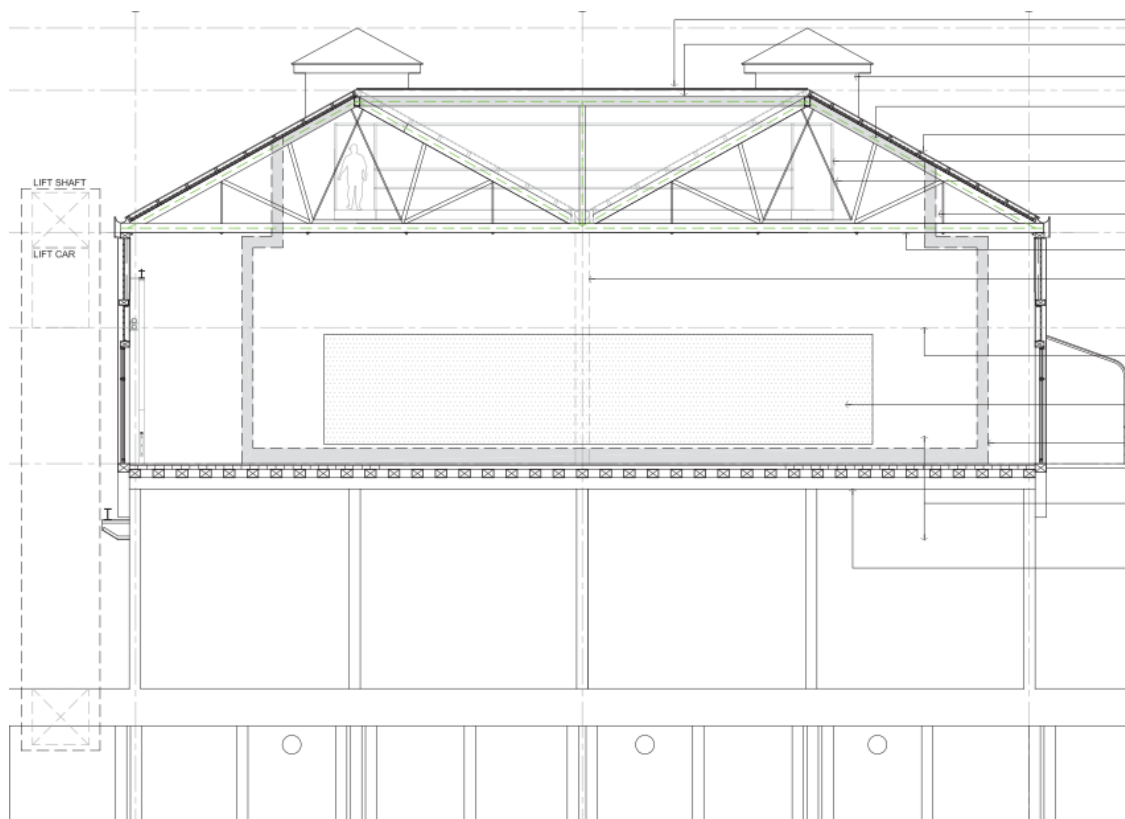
Proposed internal "boxed space" to control acoustic issues.
